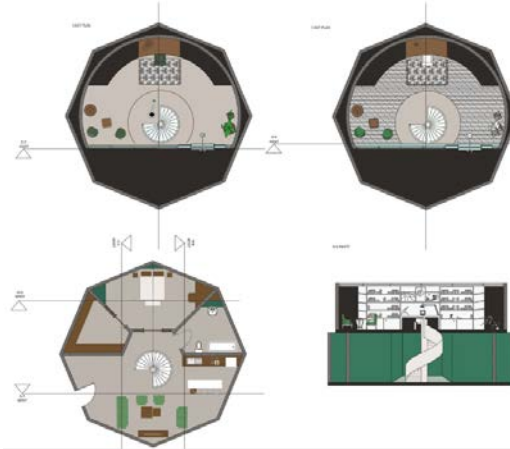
Student (Dilara Pınarbaşı) project that proposes a living space on the ground floor and an observatory on the upper floor
